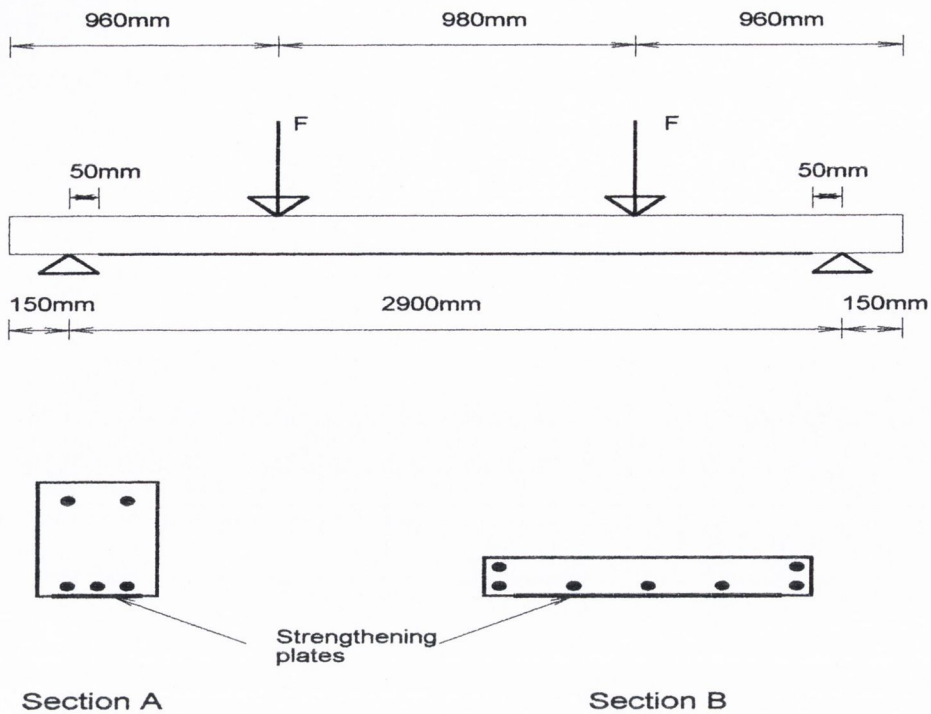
The four-point loading configuration and the psections of the two steel plated beams tested (Zarnic et al., 1999)
